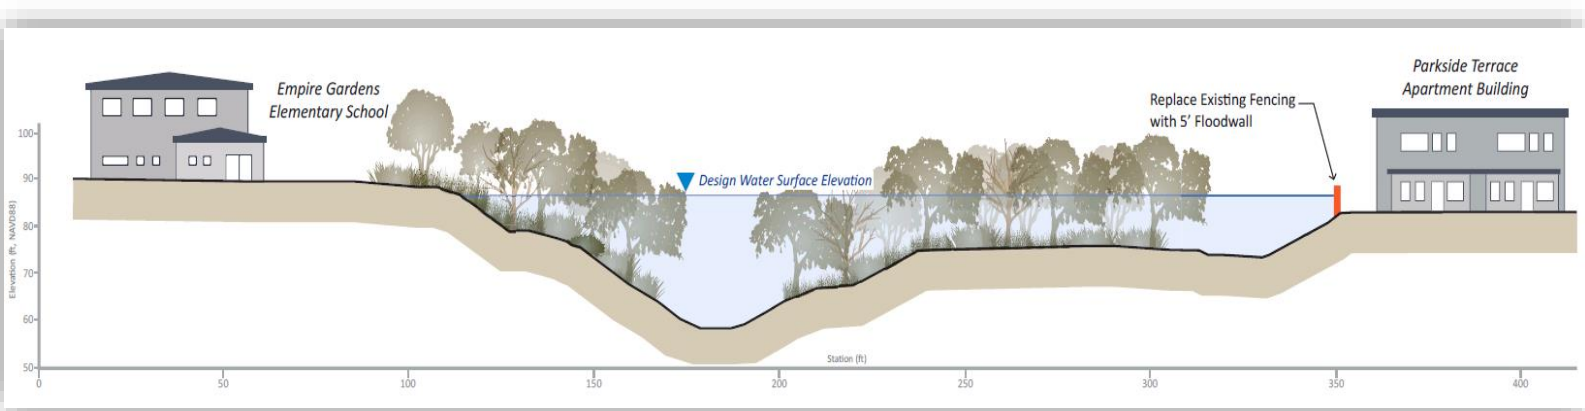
Reach 6 – Floodwalls proposed along east Coyote Creek top of banks to reduce the risk of flooding to the Parkside Terrace Apartment buildings
